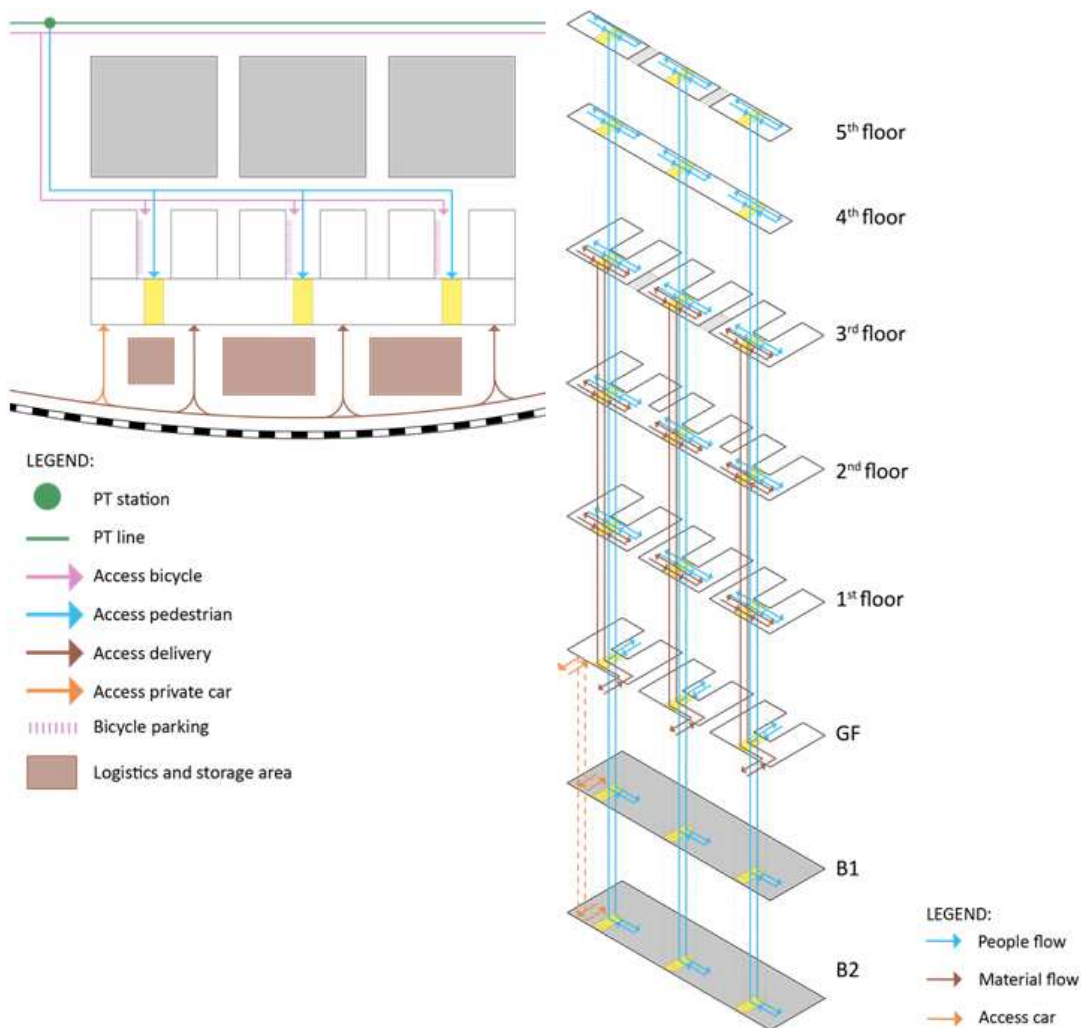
(left): Transportation concept row building. Figure 12 (right): People and material flow row building. GF...Ground floor, B...Basement
